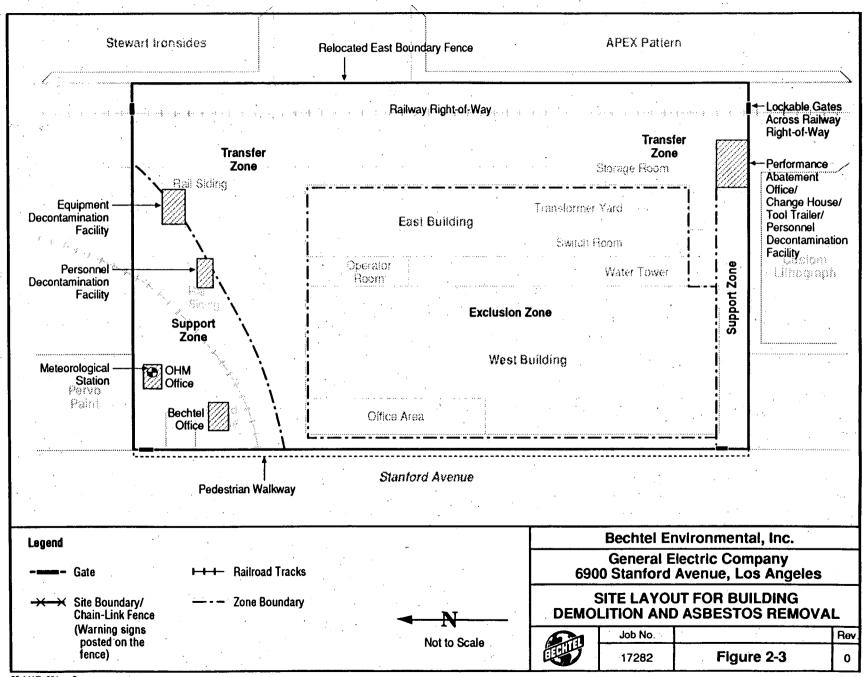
shows the site layout during building demolition and asbestos removal activities.
